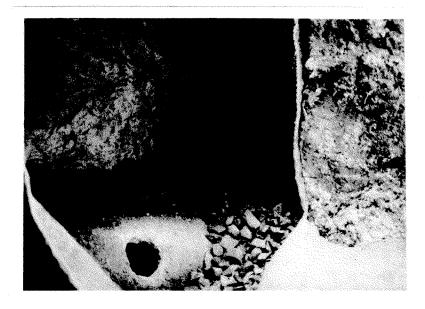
Drain opening: visual aspect of geotextile, stones and pipe
